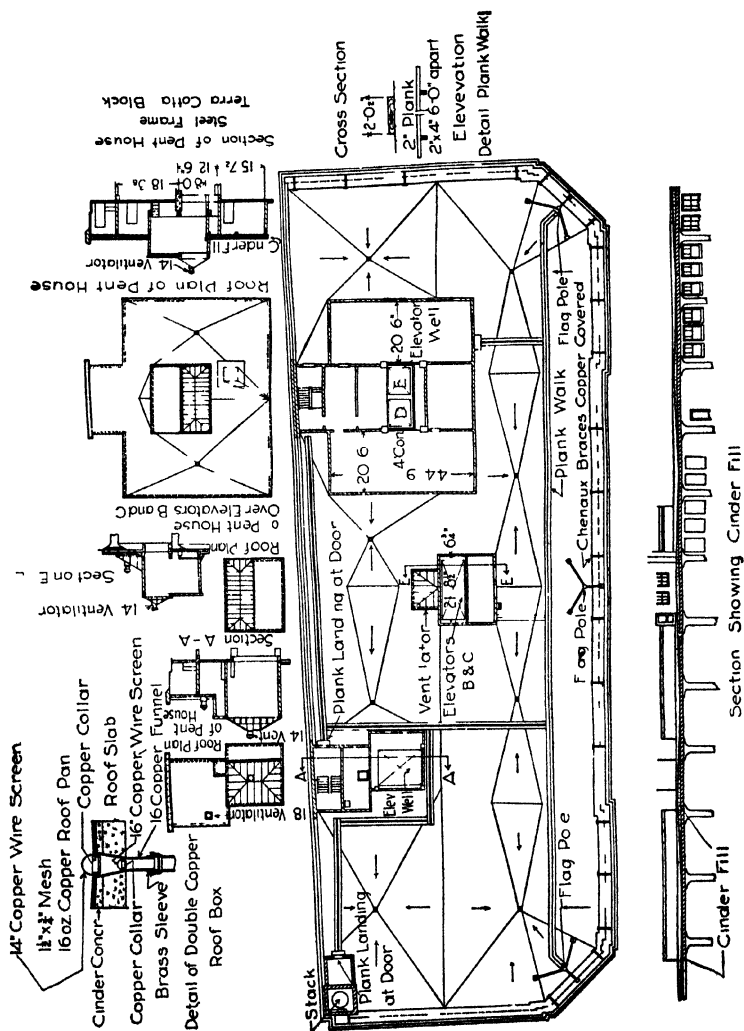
Typical Plan and Sections of Roof on a Large Building Showing Penthouses, Drainage Slopes and Double Roof. Pane Furniture Building, Boston, Mass. (See p. 642)
